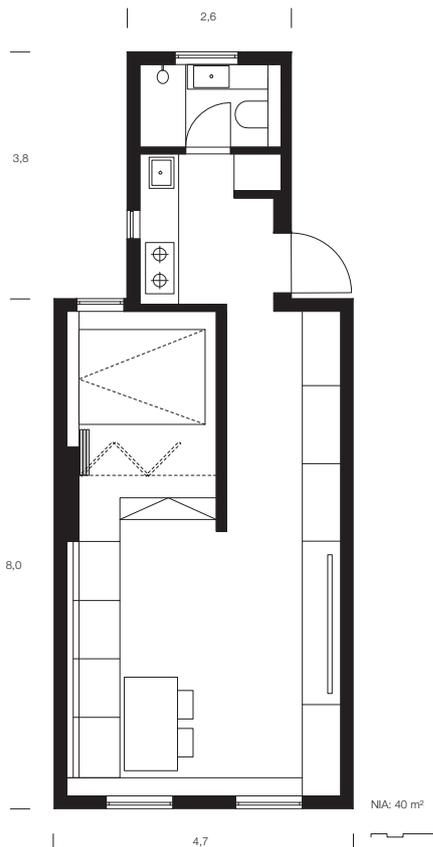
More Design Office - Folding apartment - floor plan
